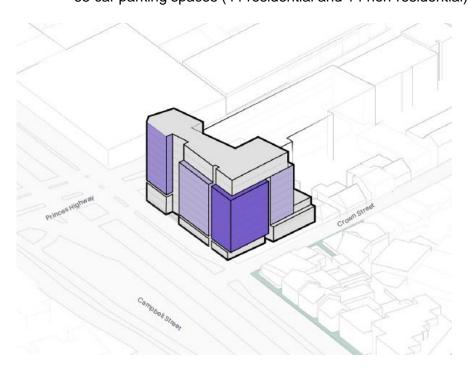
Proposed building form from south-west view (Source: Studio.SC)
